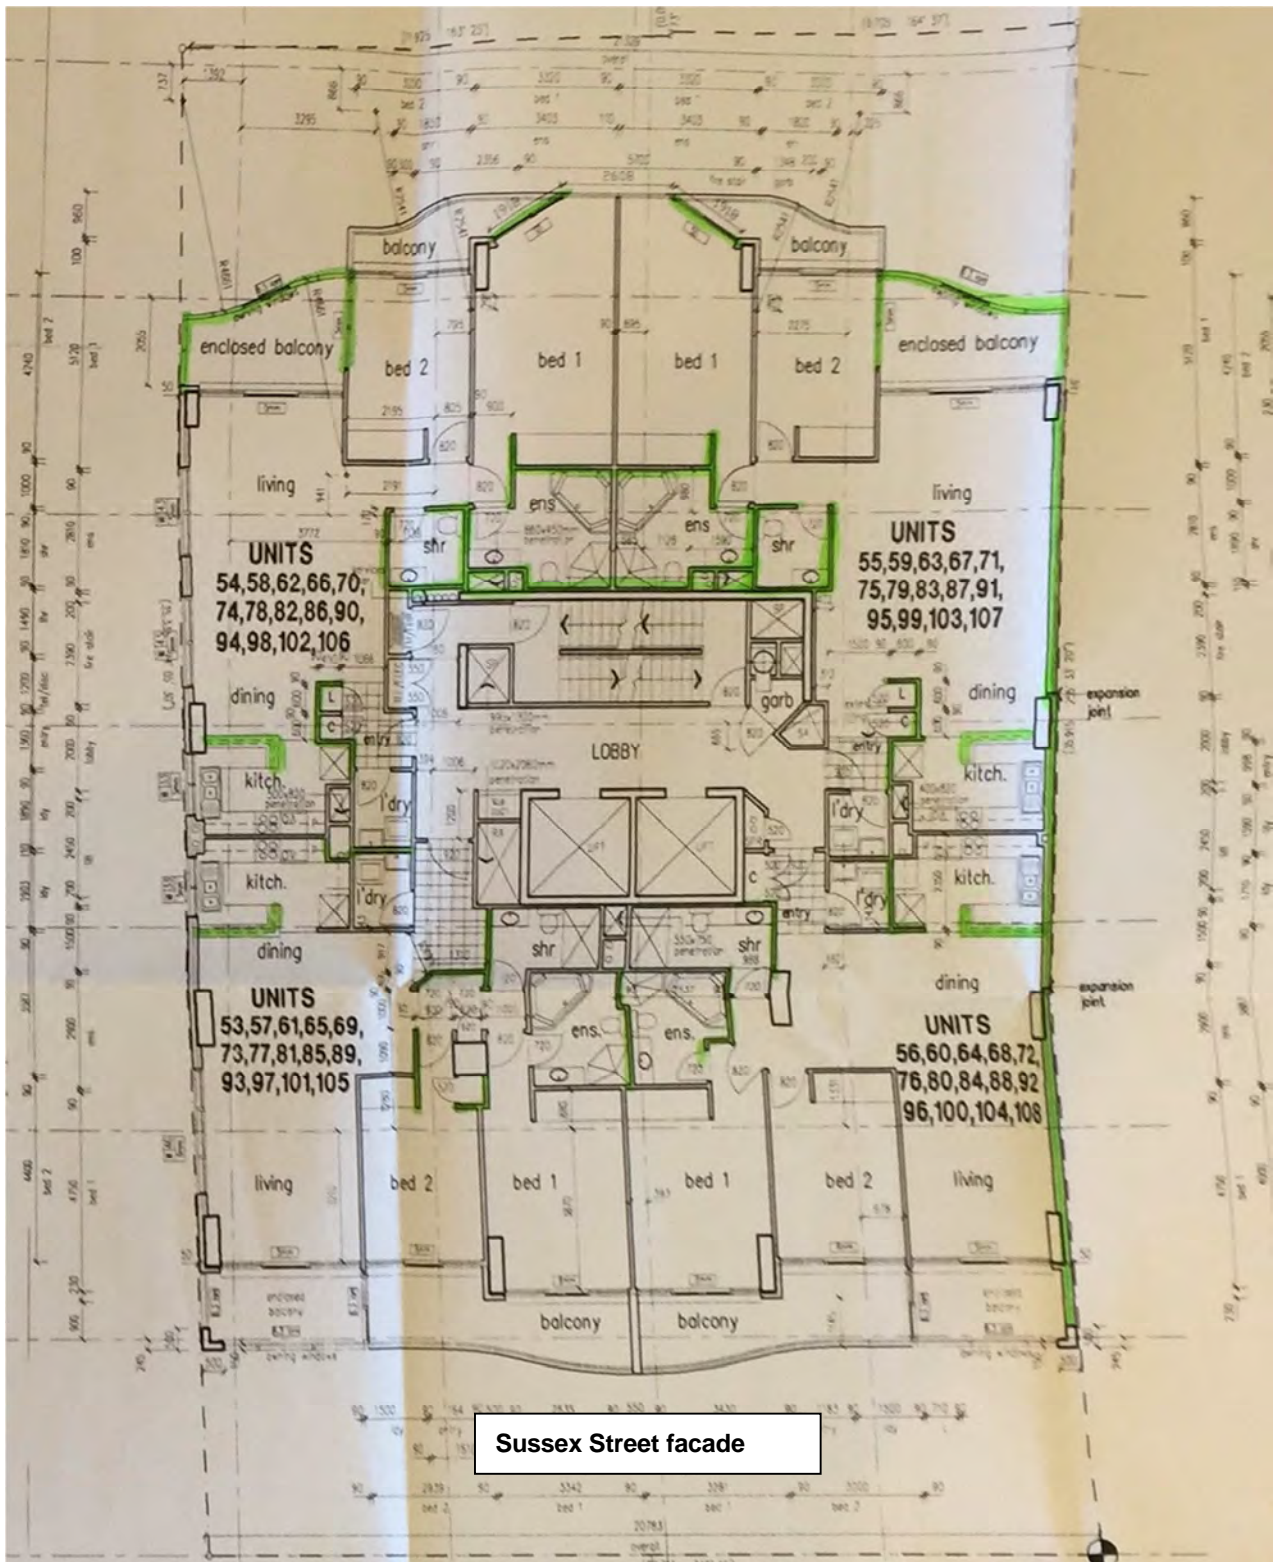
Level 16 – Level 29 Floor Plan (Astoria)
